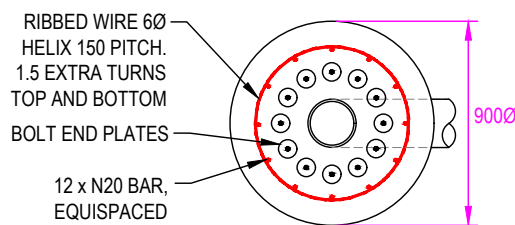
C: BASE PILE (PLAN SECTION C)
